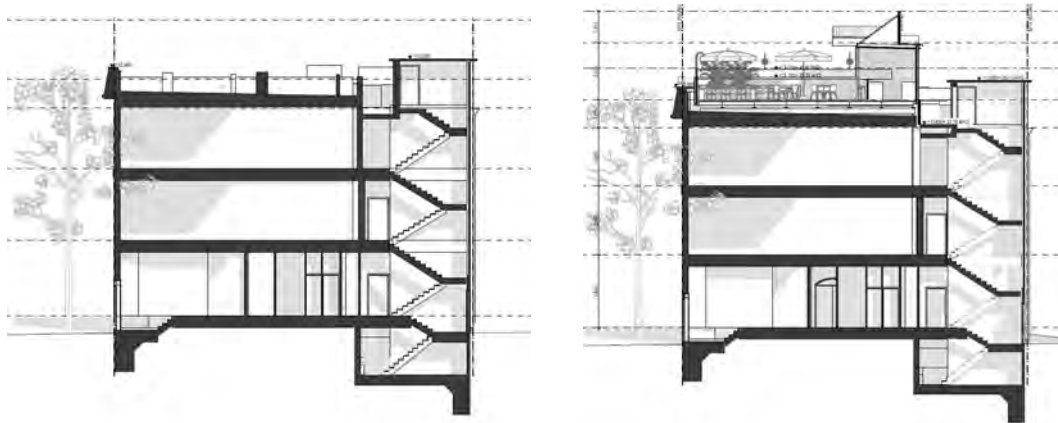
Existing (left) and proposed (right) sections (Source: Applicant)
